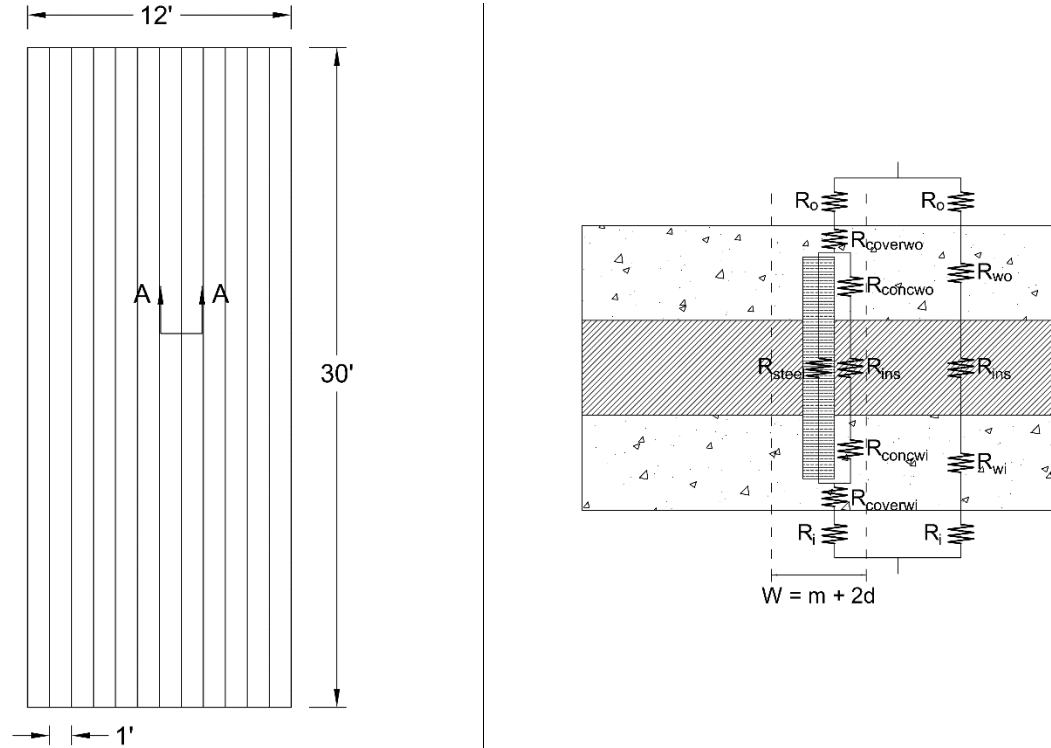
Steel truss connector example panel layout and cross-section with electrical circuit analogy
